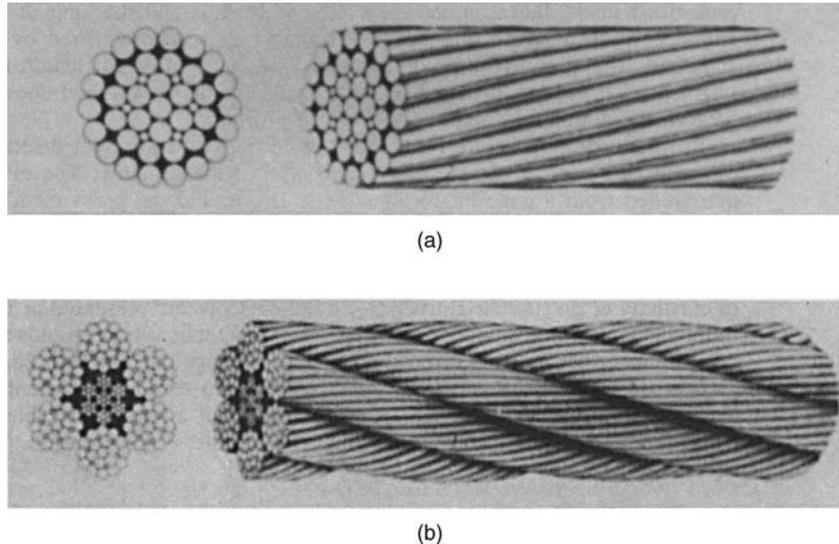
Configuration of (a) structural strand and (b) structural rope. (Reprinted with permission from J. B. Scalzi et al., "Design Fundamentals of Cable Roof Structures," ADUSS 55-3580-01, U.S. Steel.)
